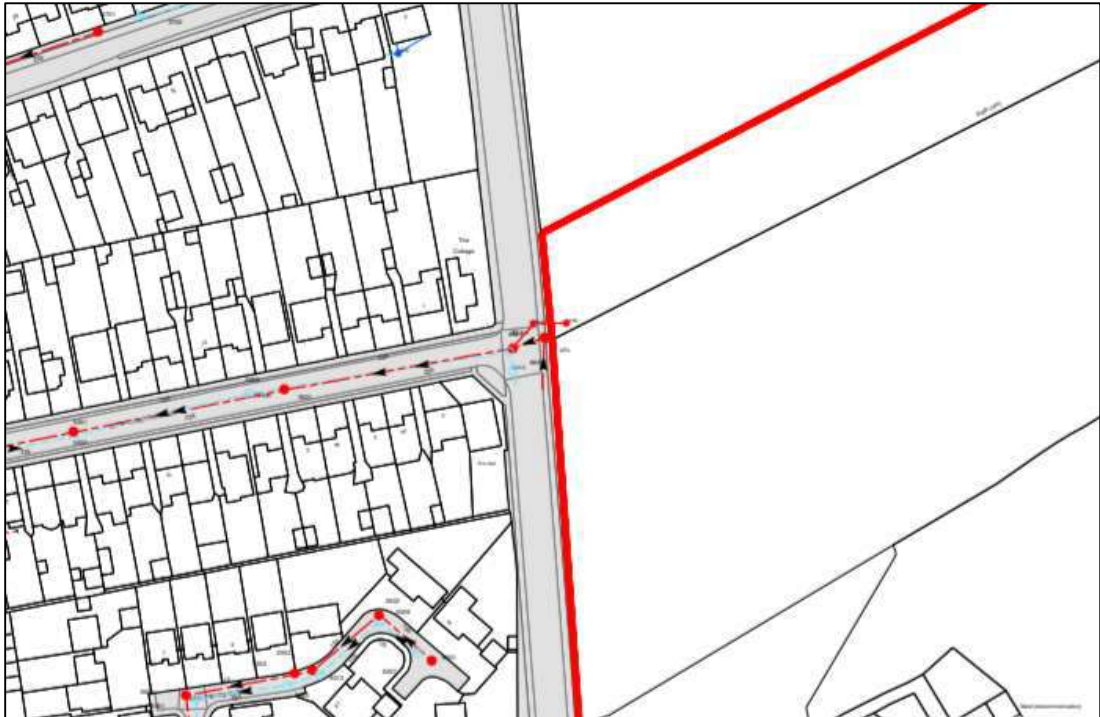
Sewer Asset Plan Extract (Source: Thames Water asset records)
